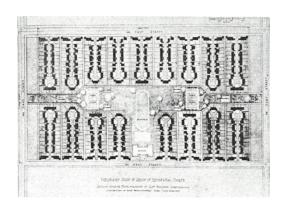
9 Radburn Superblock Plan (Broadbent, 1990: 127)
